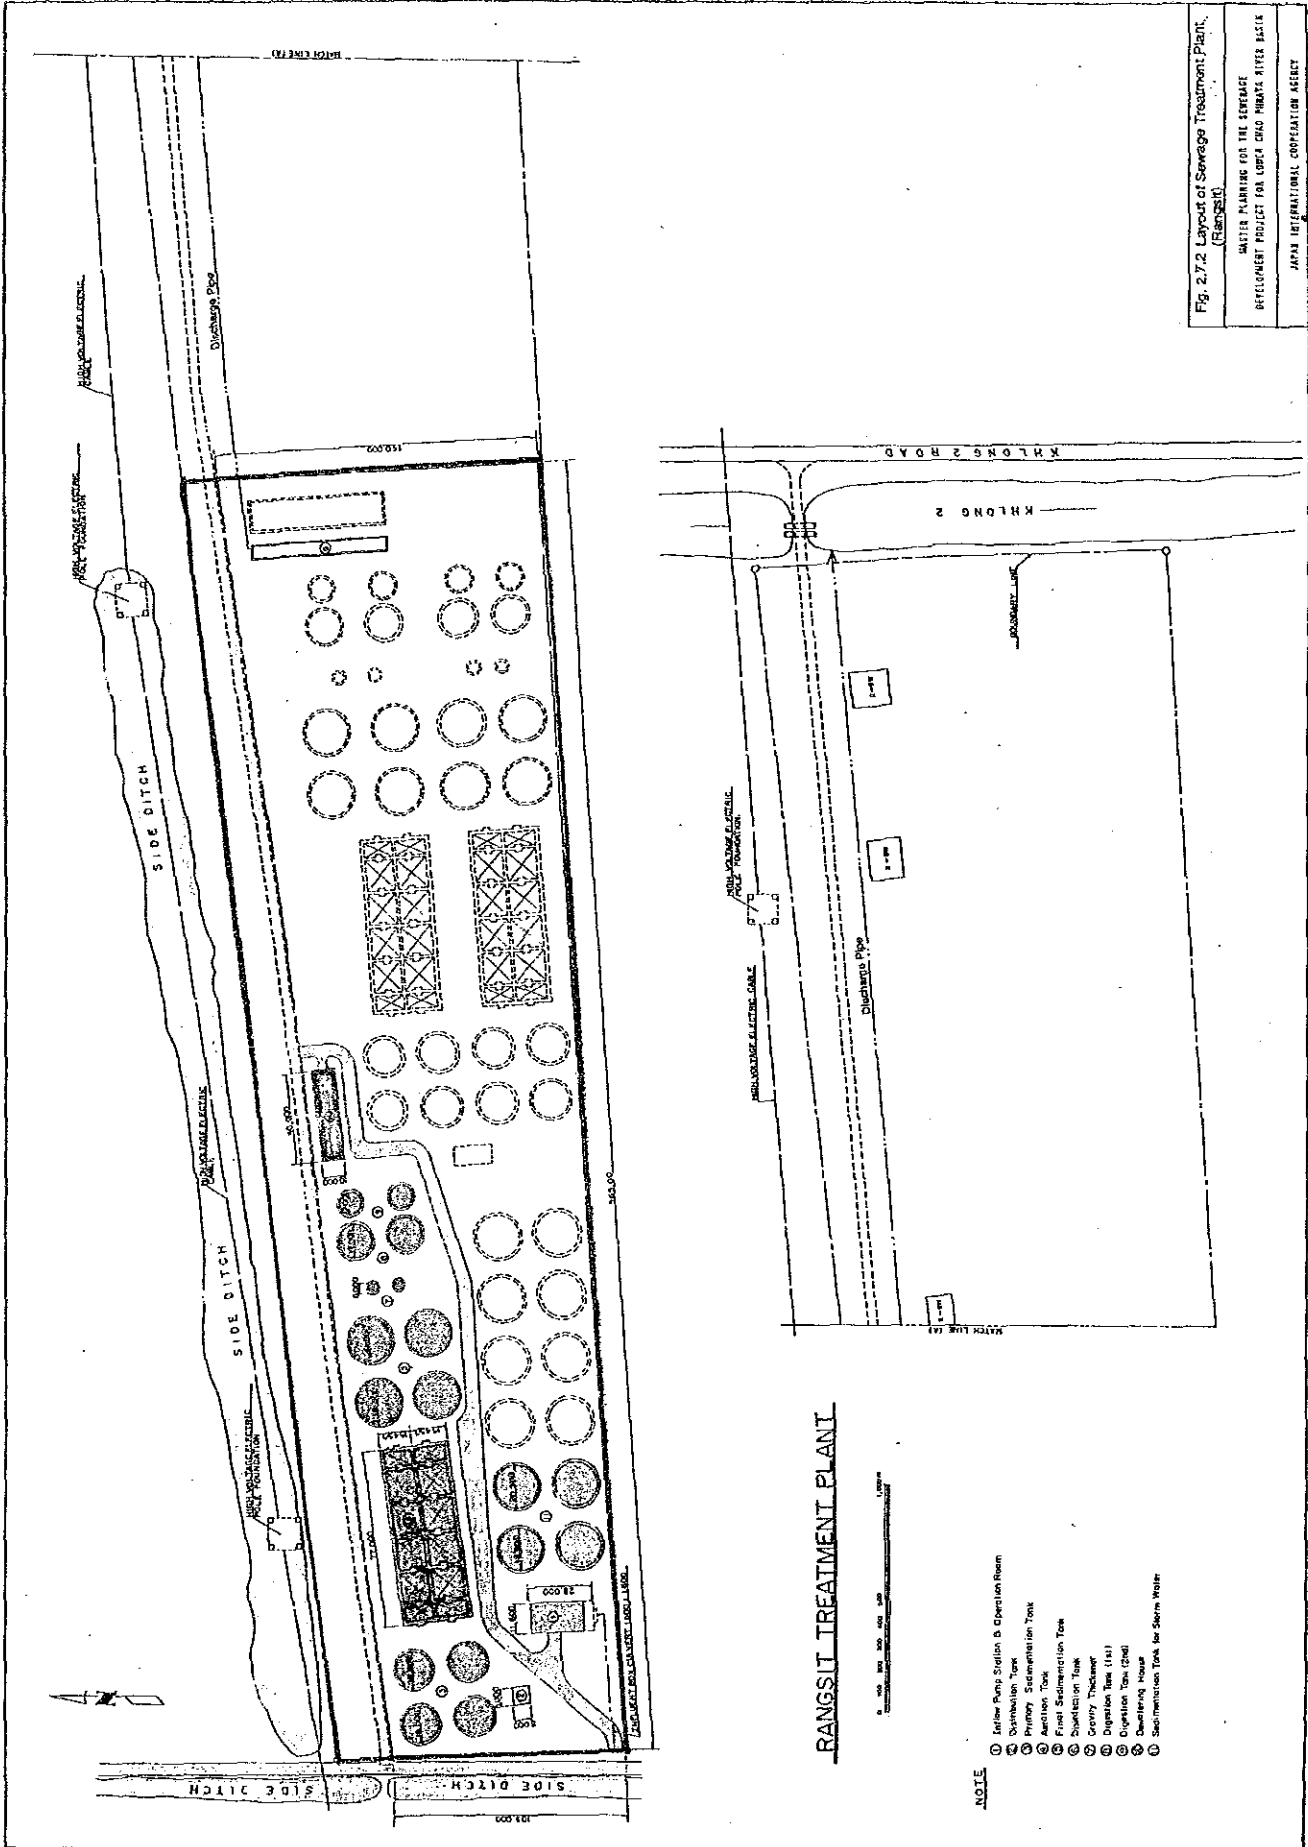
Layout of Sewage Treatment Plant.
